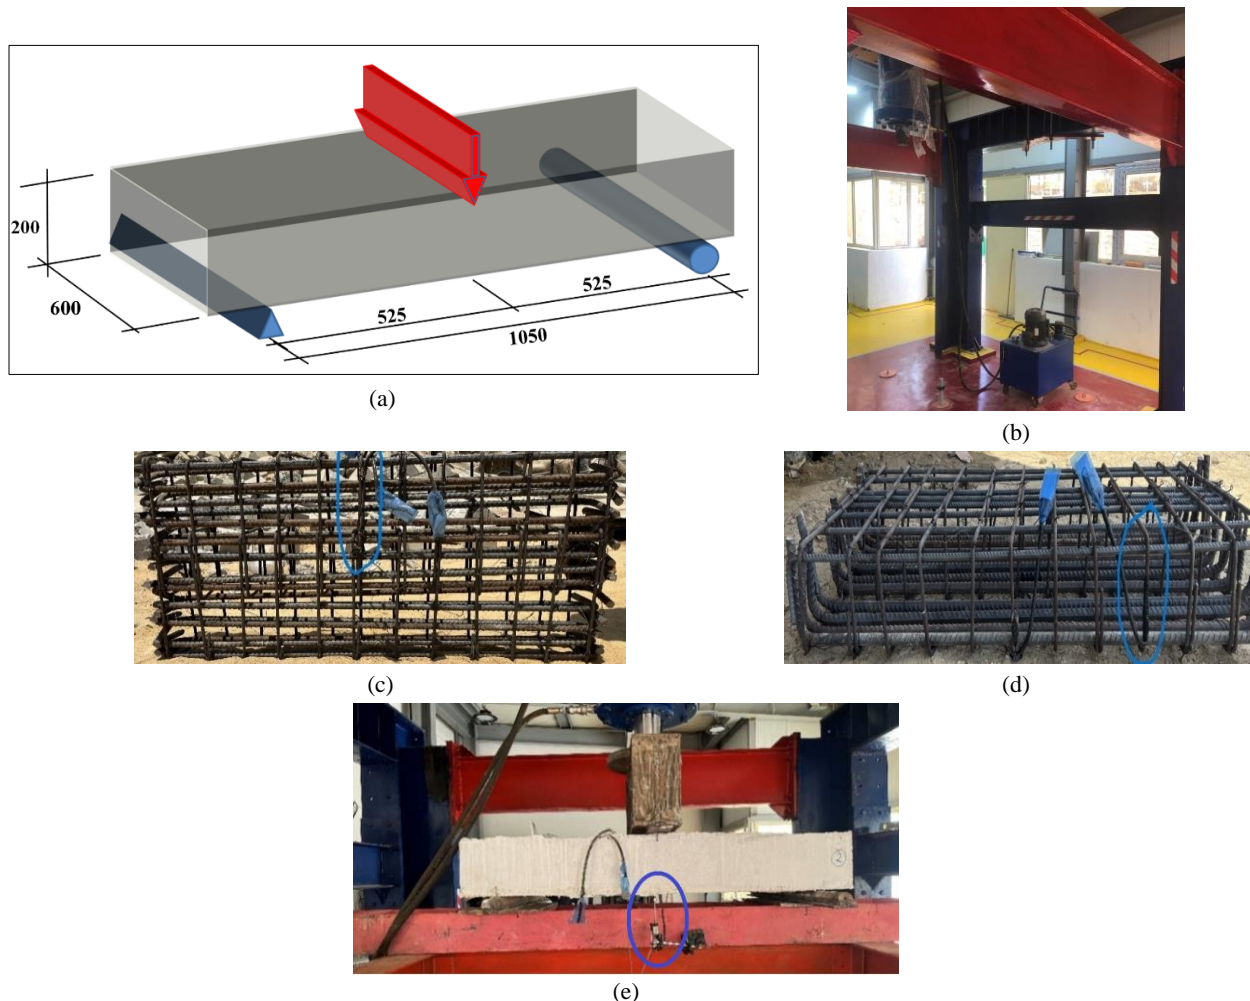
Samples instrumentation and test configurations, a) test setup, b) testing frame, c) longitudinal rebars strain gauge, d) stirrups strain gauge, e) LVTDs locations
